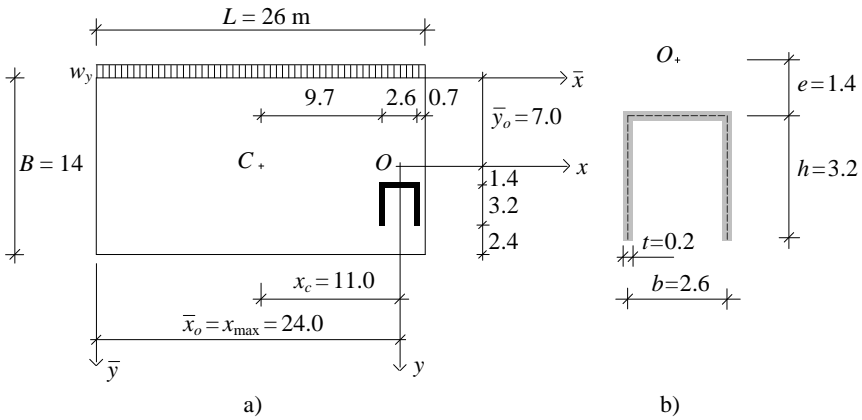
Kollár’s building. a) Layout A, b) bracing core.
